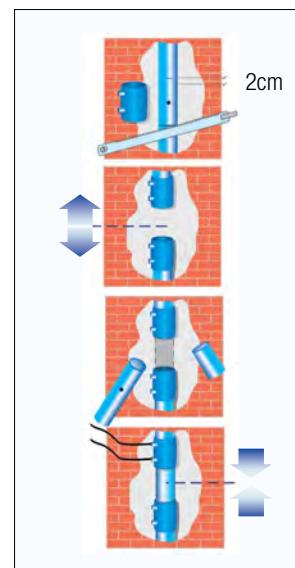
Repair of Concealed Pipe with Electrofusion Welding
